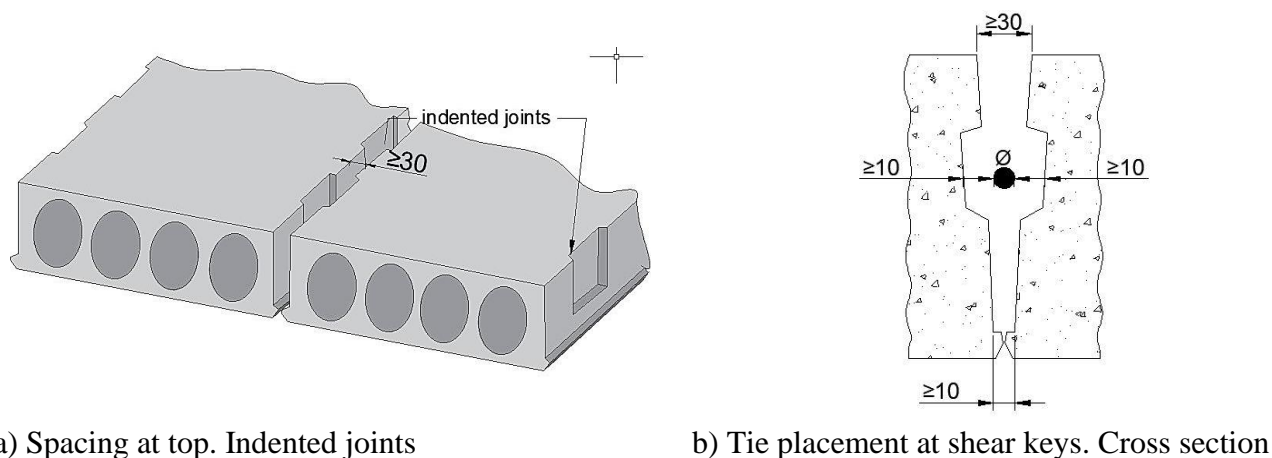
Grouted shear key joints - Reproduced from DIN EN 1168-08 (Technical Committee CEN/TC 229 2010).
